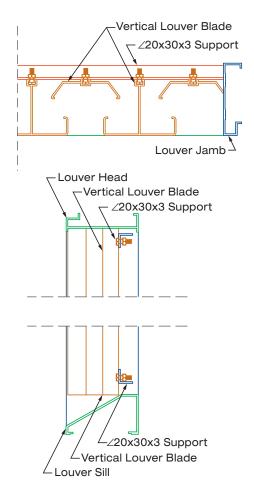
Cross section of a sand trap louver showing how sand is stripped from the airstream and allowed to fall to a bottom rail and fall toward the ground outside the building. *Image courtesy of McGill Architectural Products*.
